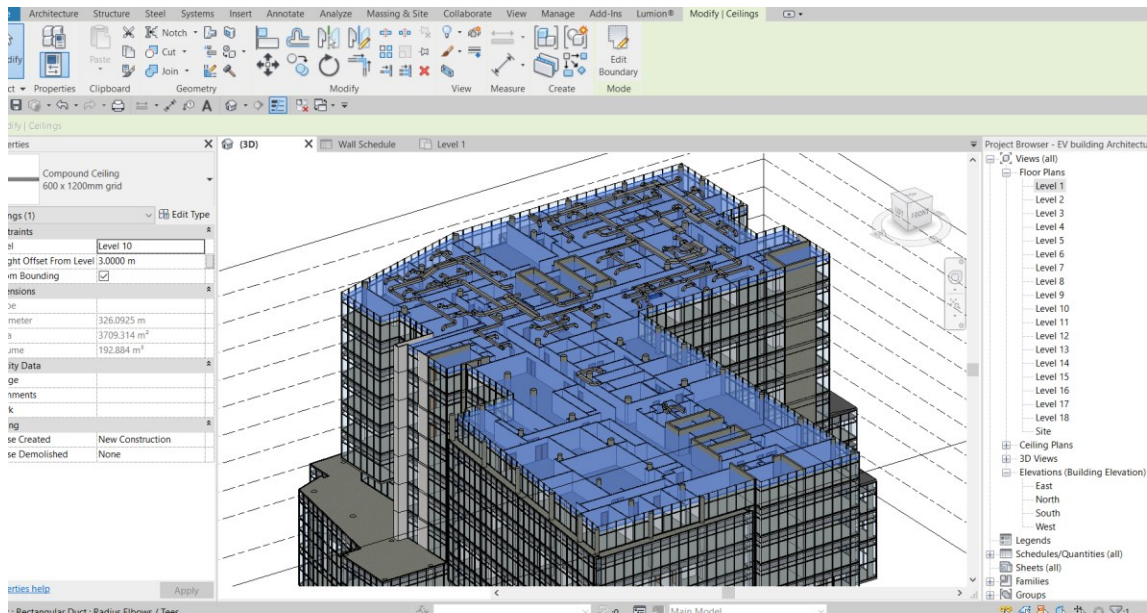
A virtual 3D model of a complex building with the structural and non-structural building components in Autodesk Revit
